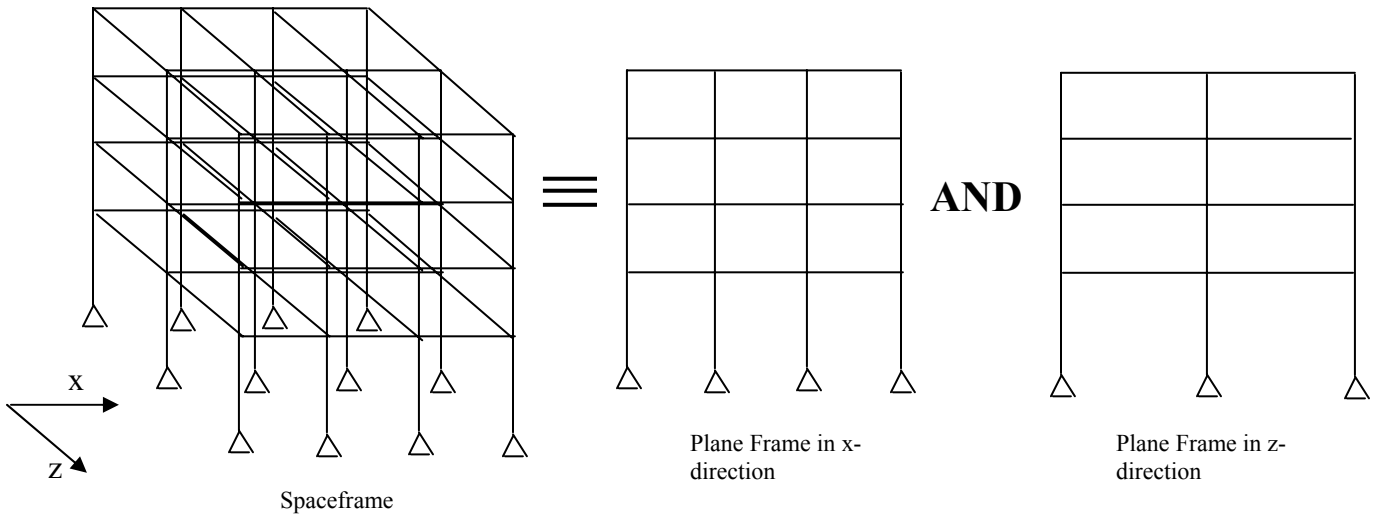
Idealizing a Space Frame as 2 Plane Frames
